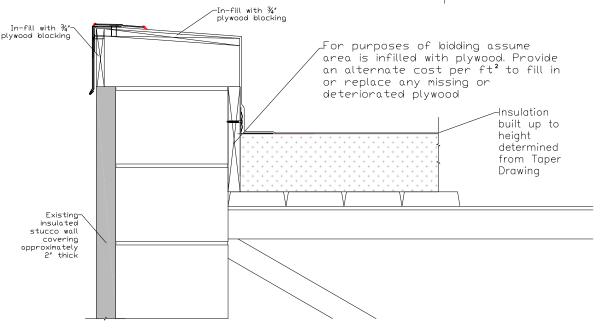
Detail R- Expansion Joint Between Roof #6 & Roofs #8 & #9
